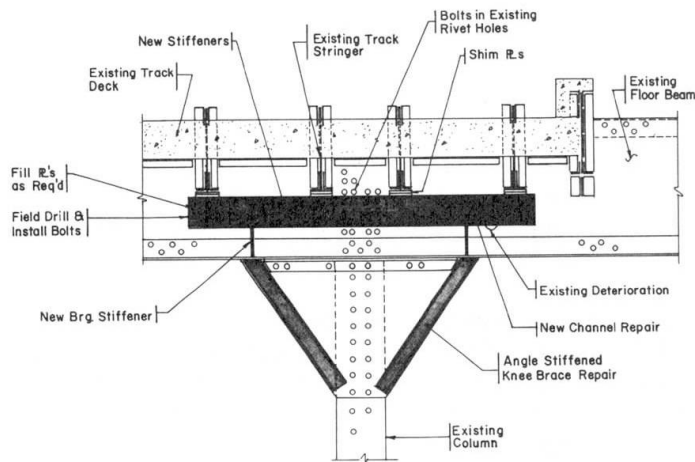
Alternate load path repair utilizing a channel and stiffened knee brace plate
